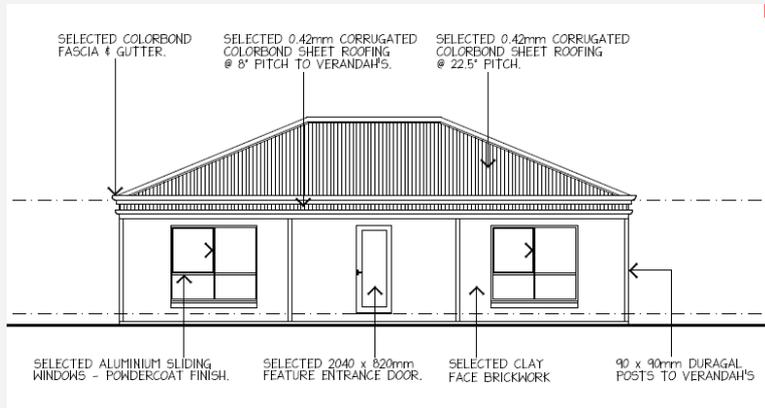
Unit 1: South elevation (fronting Euston Street)
